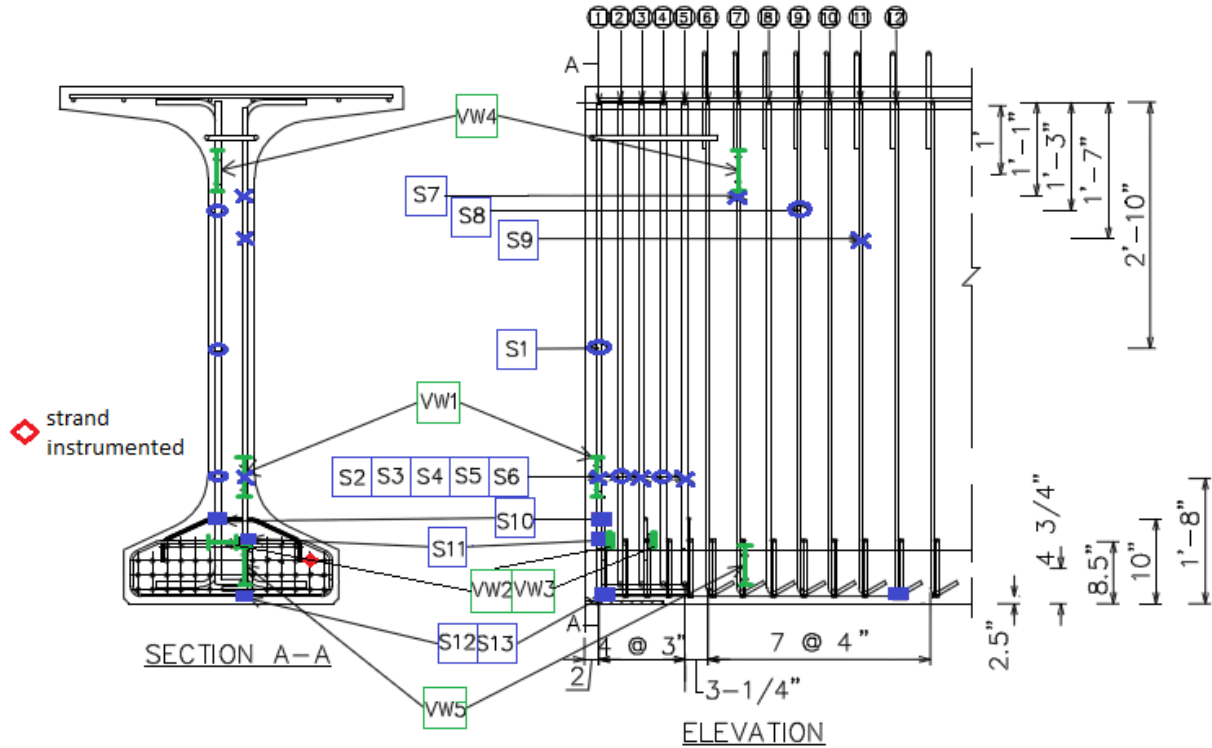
Locations of gages on strands, reinforcing bars and in concrete
